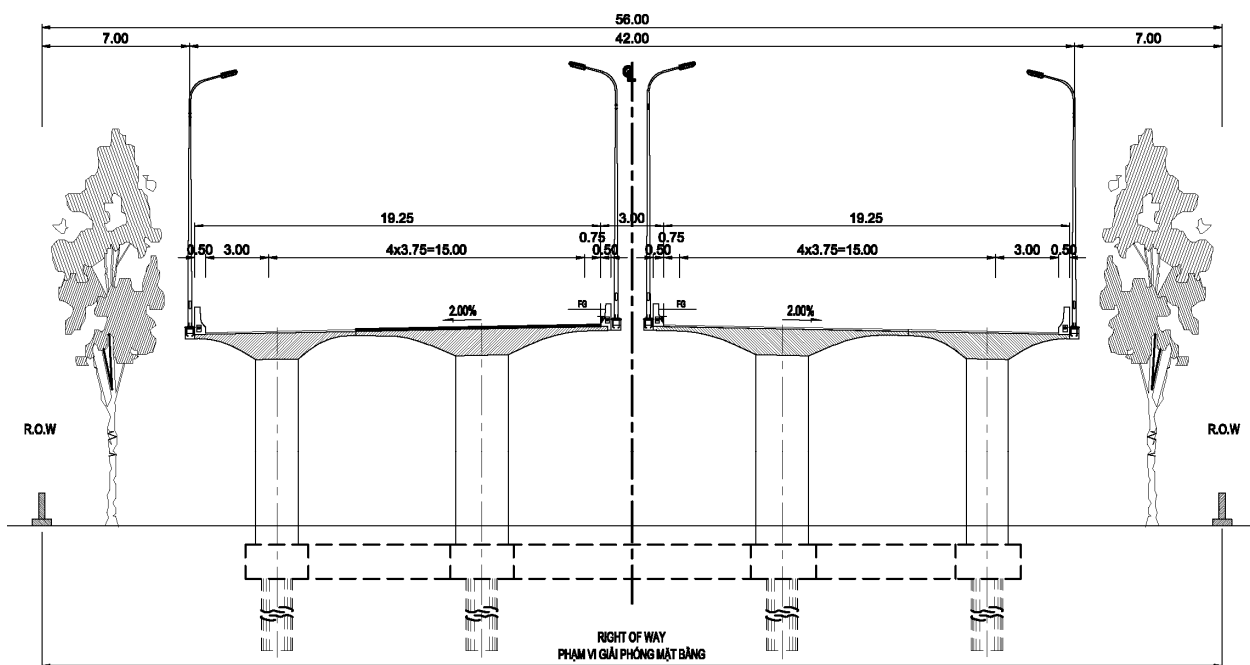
Typical 56-m width ROW in the Viaduct & Bridge Sections Phase 2
